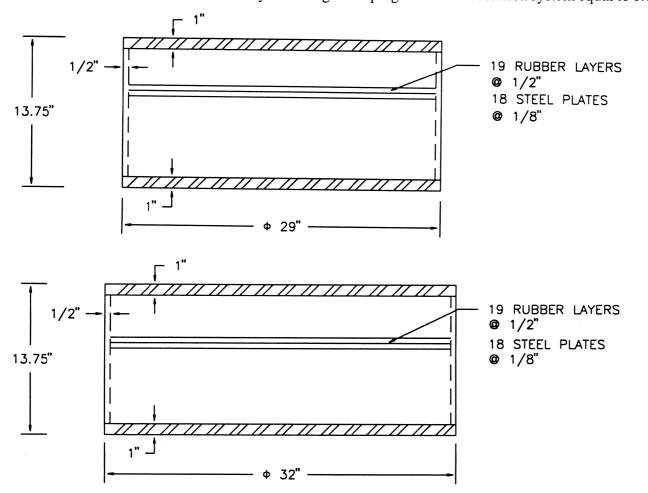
Construction of (a) High Damping Rubber Bearing, (b) Low Damping Rubber Bearing.
